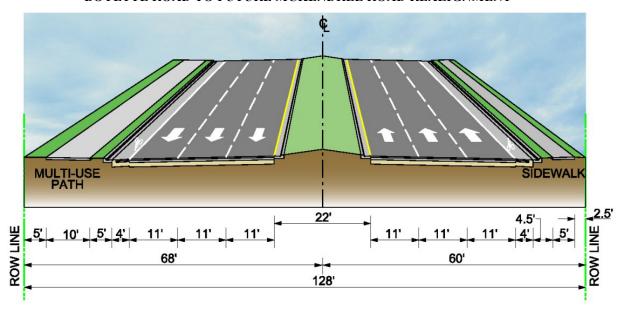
SIX-LANE DIVIDED URBAN TYPICAL SECTION FUTURE MCKENDREE ROAD REALIGNMENT TO PROMENADE TOWN CENTER
